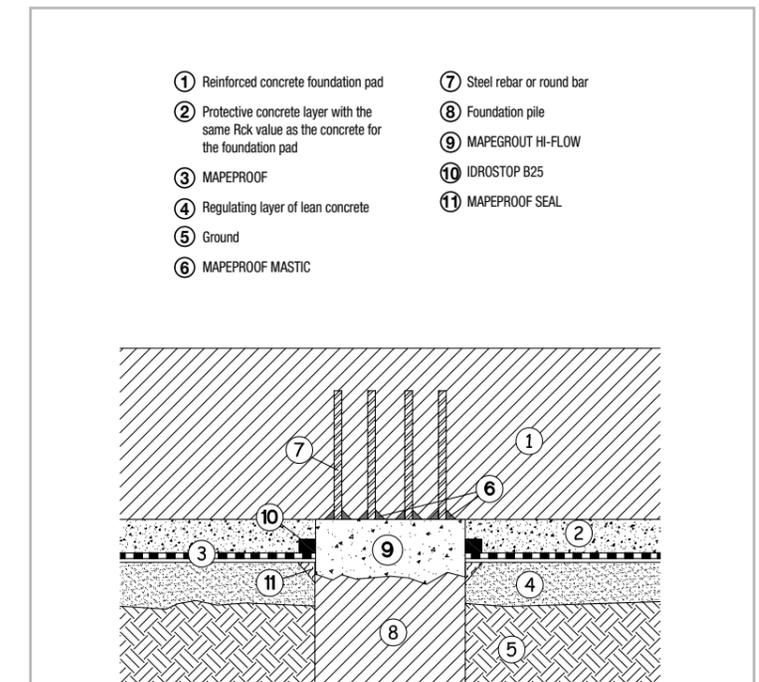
Detailed layout of waterproofing the heads of piles which work together with the foundation pad and pass through the bentonite sheet
